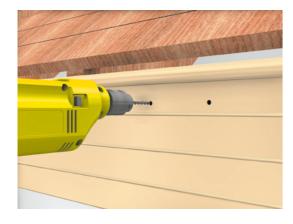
Specifics of mounting PREMIUM and STANDARD outlets
